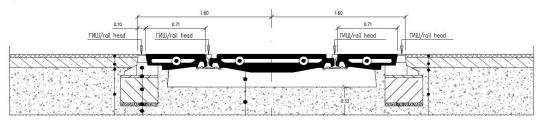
Cross section of a crossing with rubber panels in Macedonia (Railway line Bitola -Kremenica)
